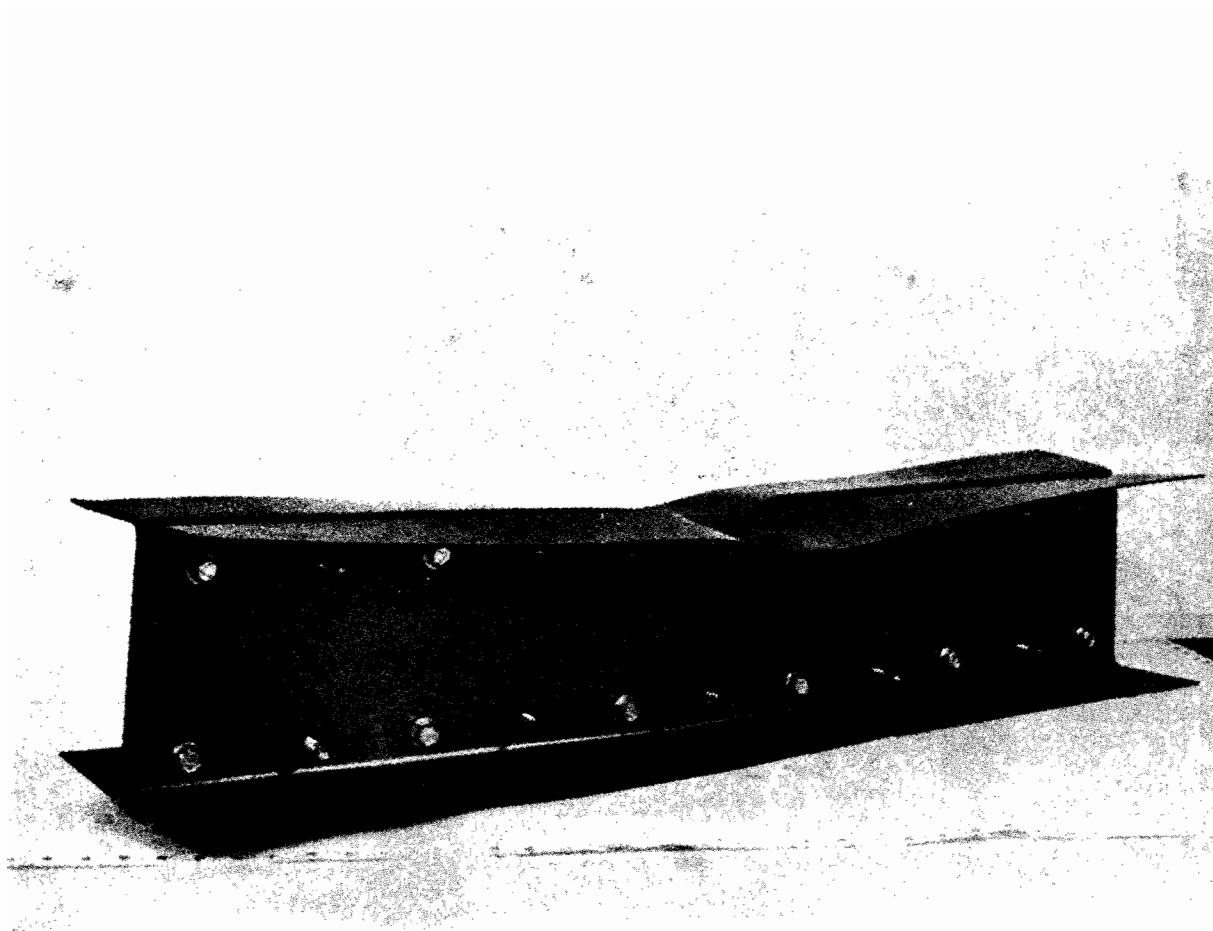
Photograph Showing Typical Failure of I-Beam
